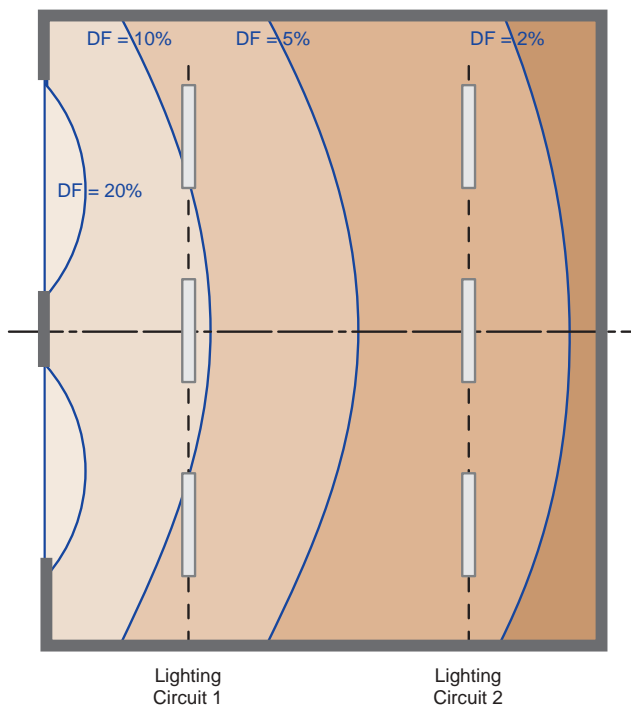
Room plan showing window positions and example daylight factor (DF) contours. Also ceiling mounted luminaires and electric lighting circuits.
